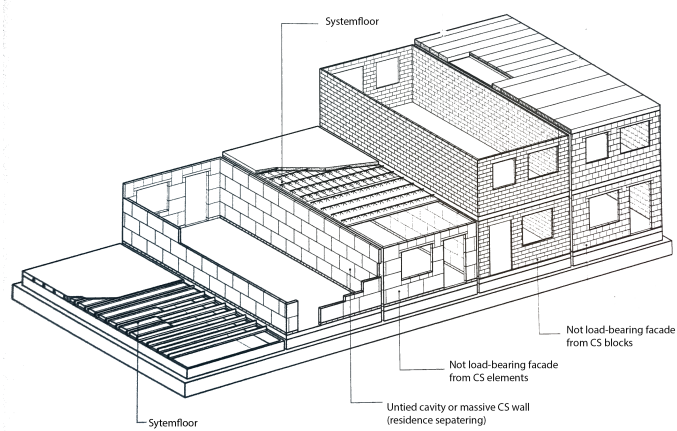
Traditionally built residences with masonry cavity walls and system floors
